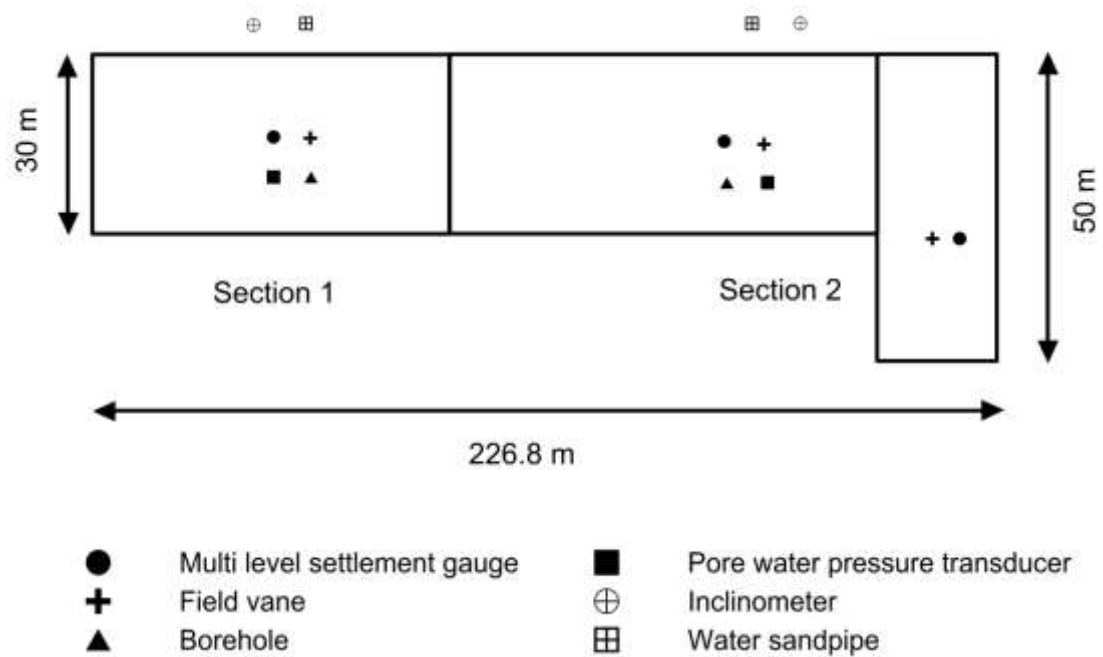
Plan view of the area of improved soil, and the instrumentation
